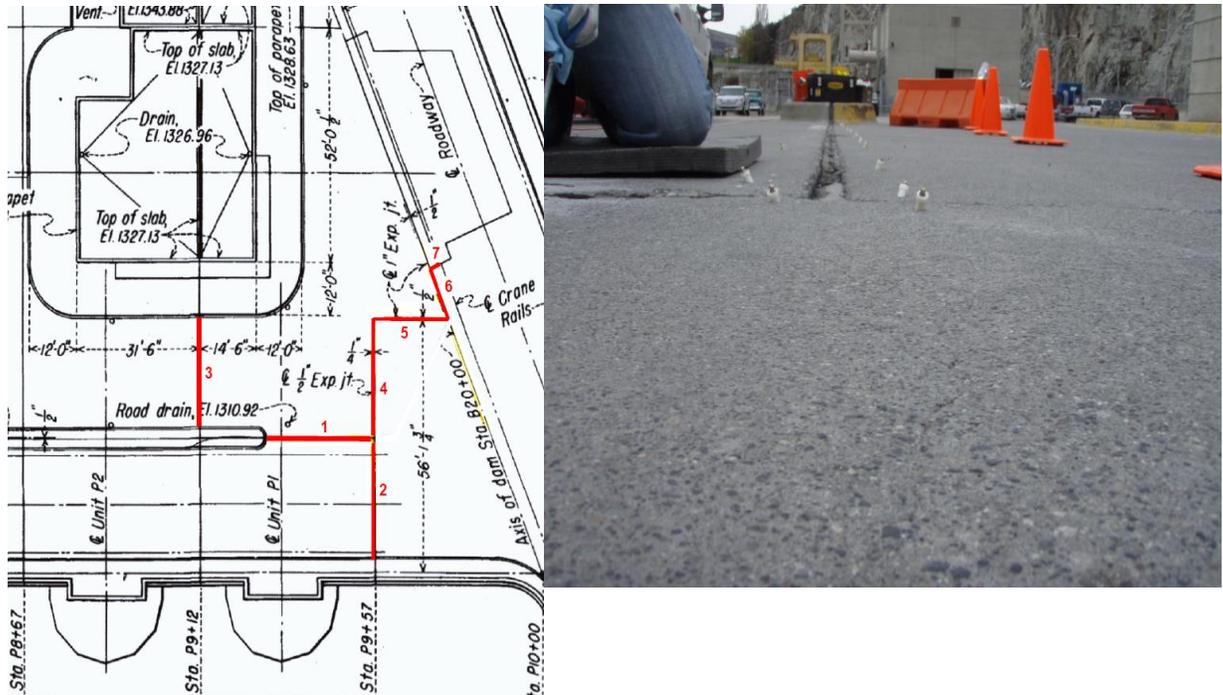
A portion of Grand Coulee drawing 222-D-11209 showing the Pump Generation Plant deck joints that were grouted and line 1 with grout ports and zerks installed.
